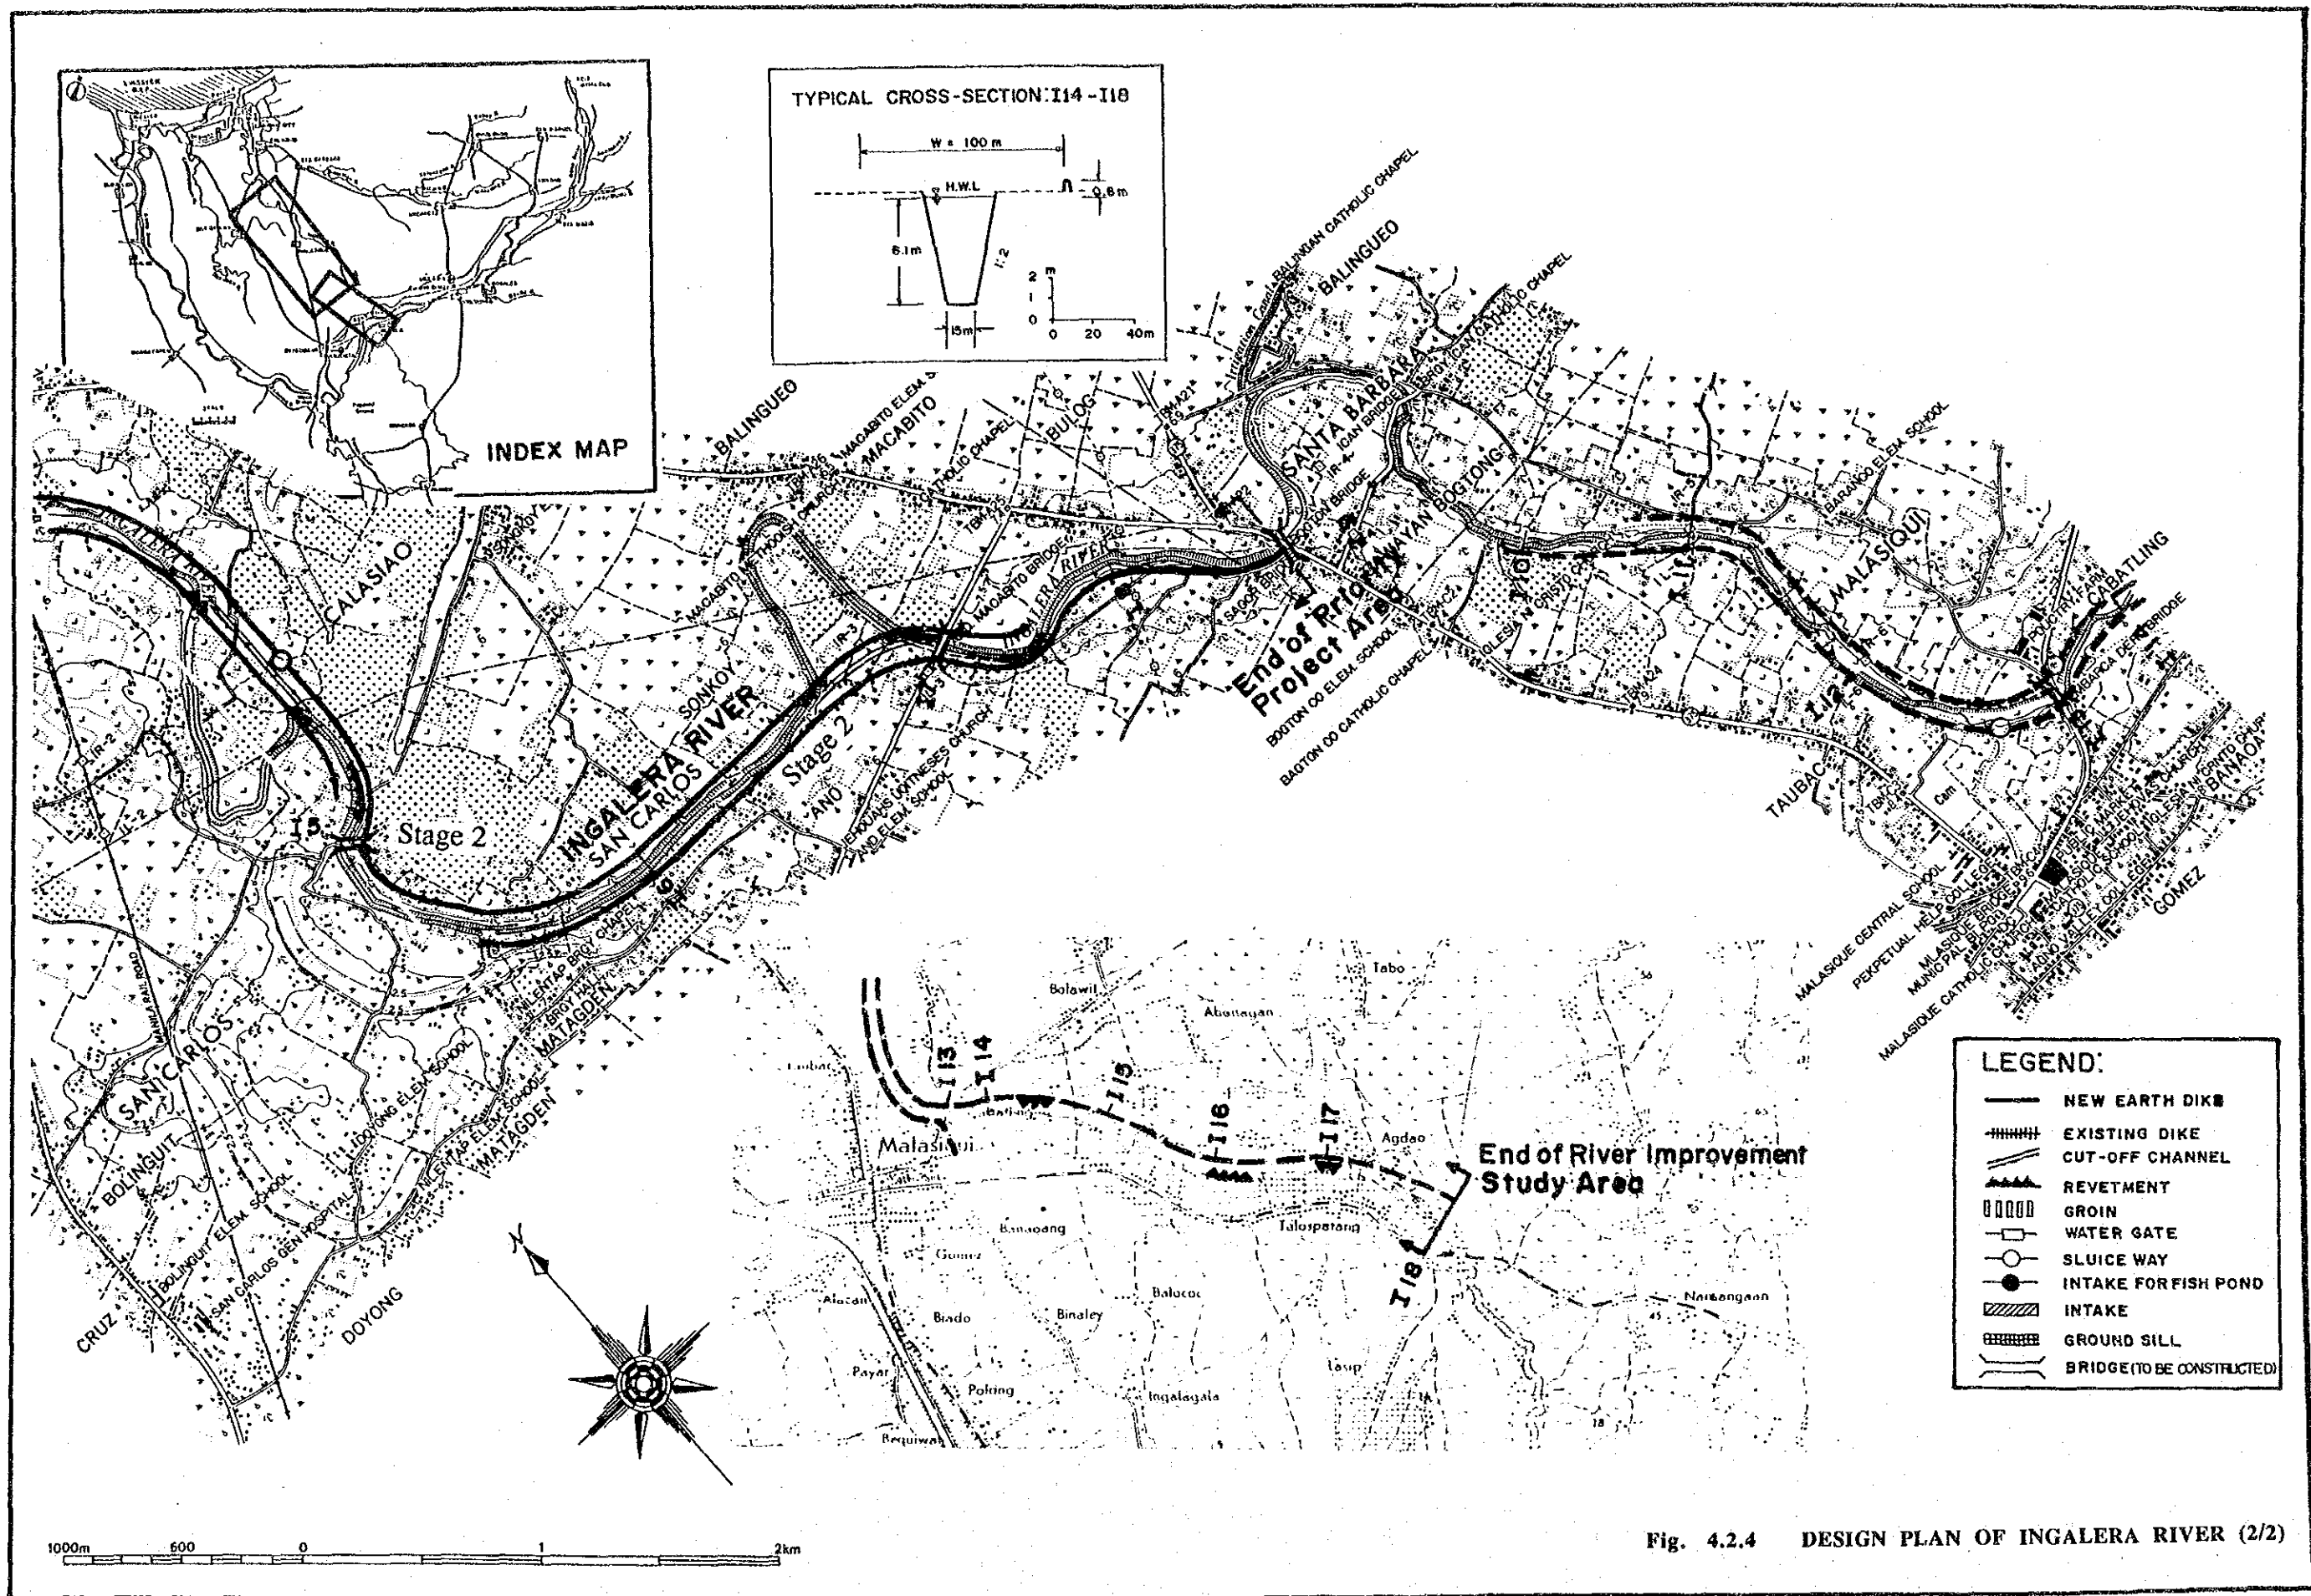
DESIGN PLAN OF INGALERA RIVER (2/2)
